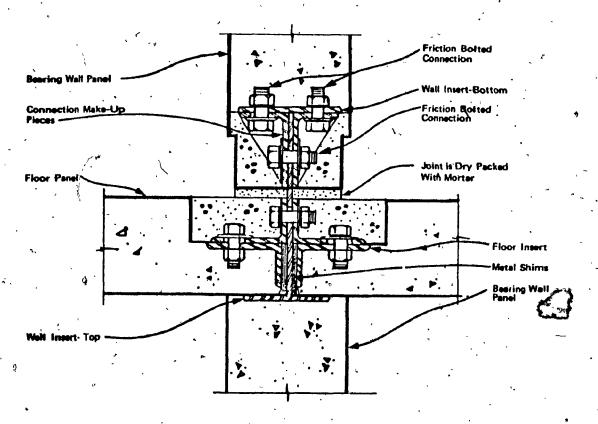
D/C, Internal Wall to Floor Connection (Ref. 32)
